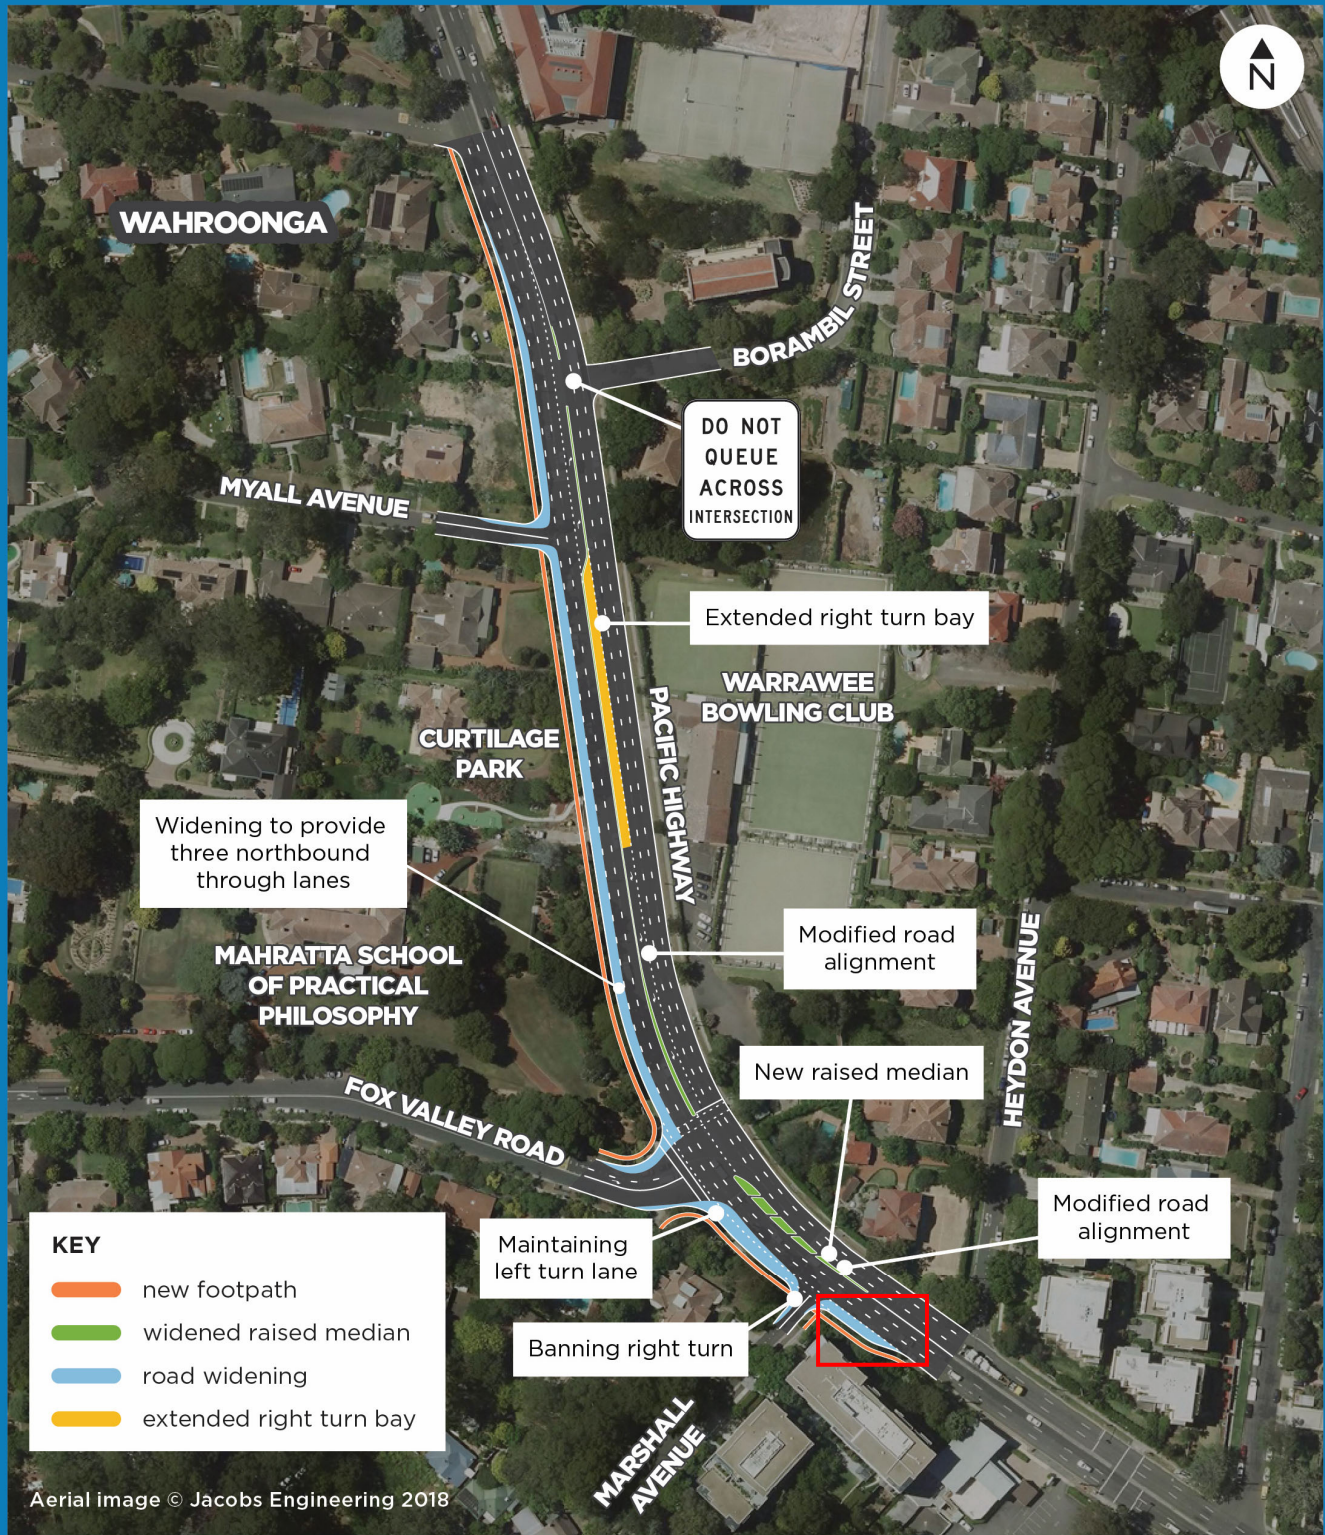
Main features of the proposal: Intersection 2 – Pacific Highway at Fox Valley Road, Wairoonga/Warrawee – Note the road widening area outlined in red south of Marshall Avenue in this figure is no longer proposed
